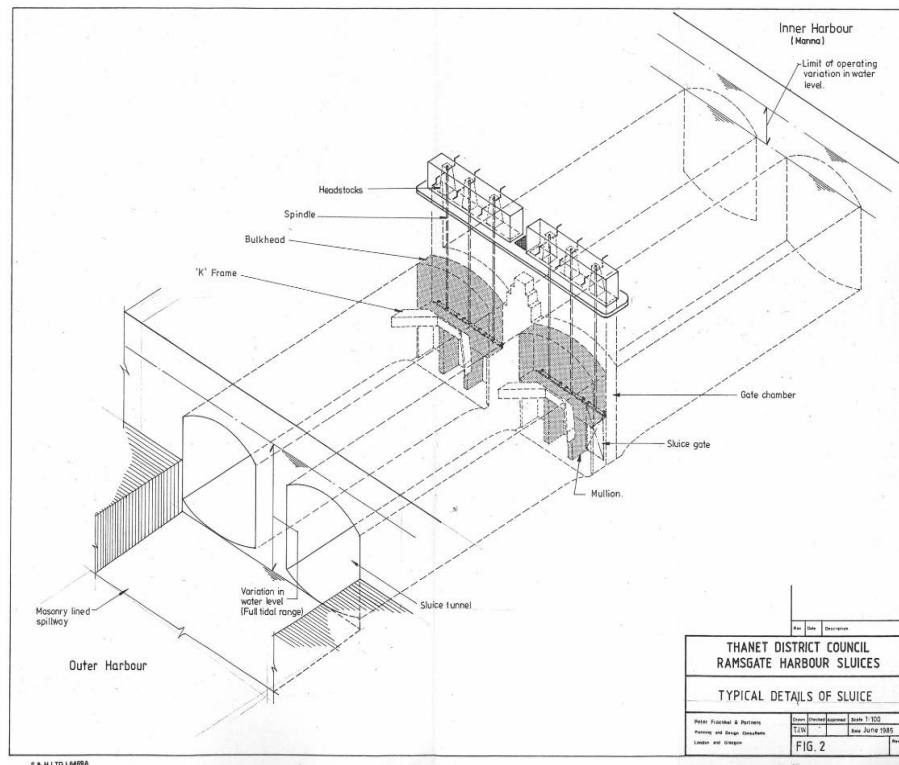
Typical Sluice Tunnel configuration, courtesy of the Peter Fraenkel & Partners report 1985.
